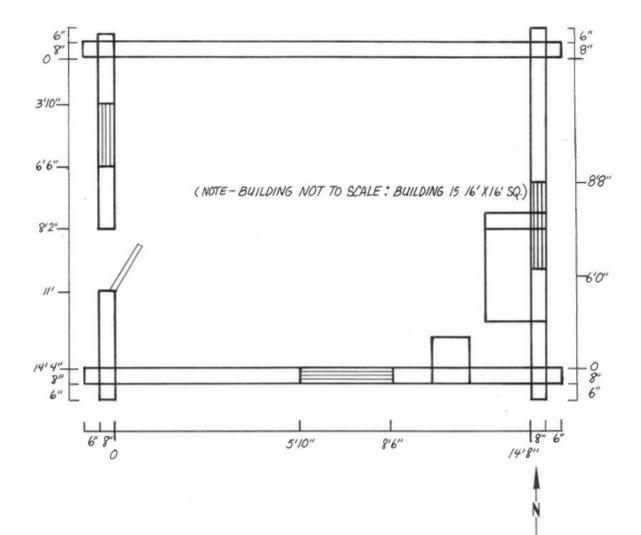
FLOOR PLAN - 4 MILE CABIN
